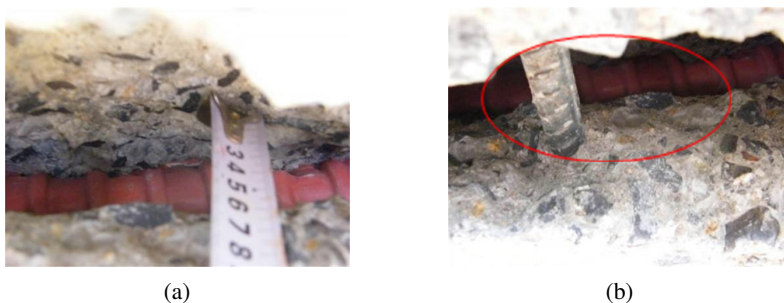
Cracks on the bottom slab of the box girder: (a) Span No. 2 longitudinal crack corrugate pipe deterioration; (b) Span No.2 Longitudinal crack hollow section
